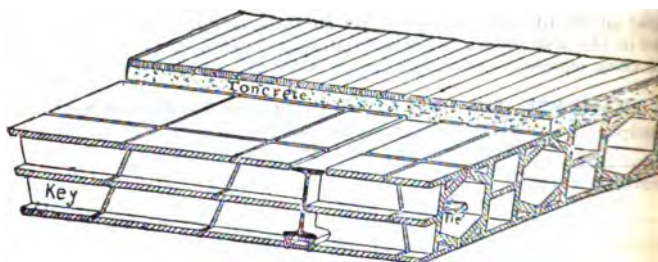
Johnson End-construction Tile Floor-arch. Original Form
